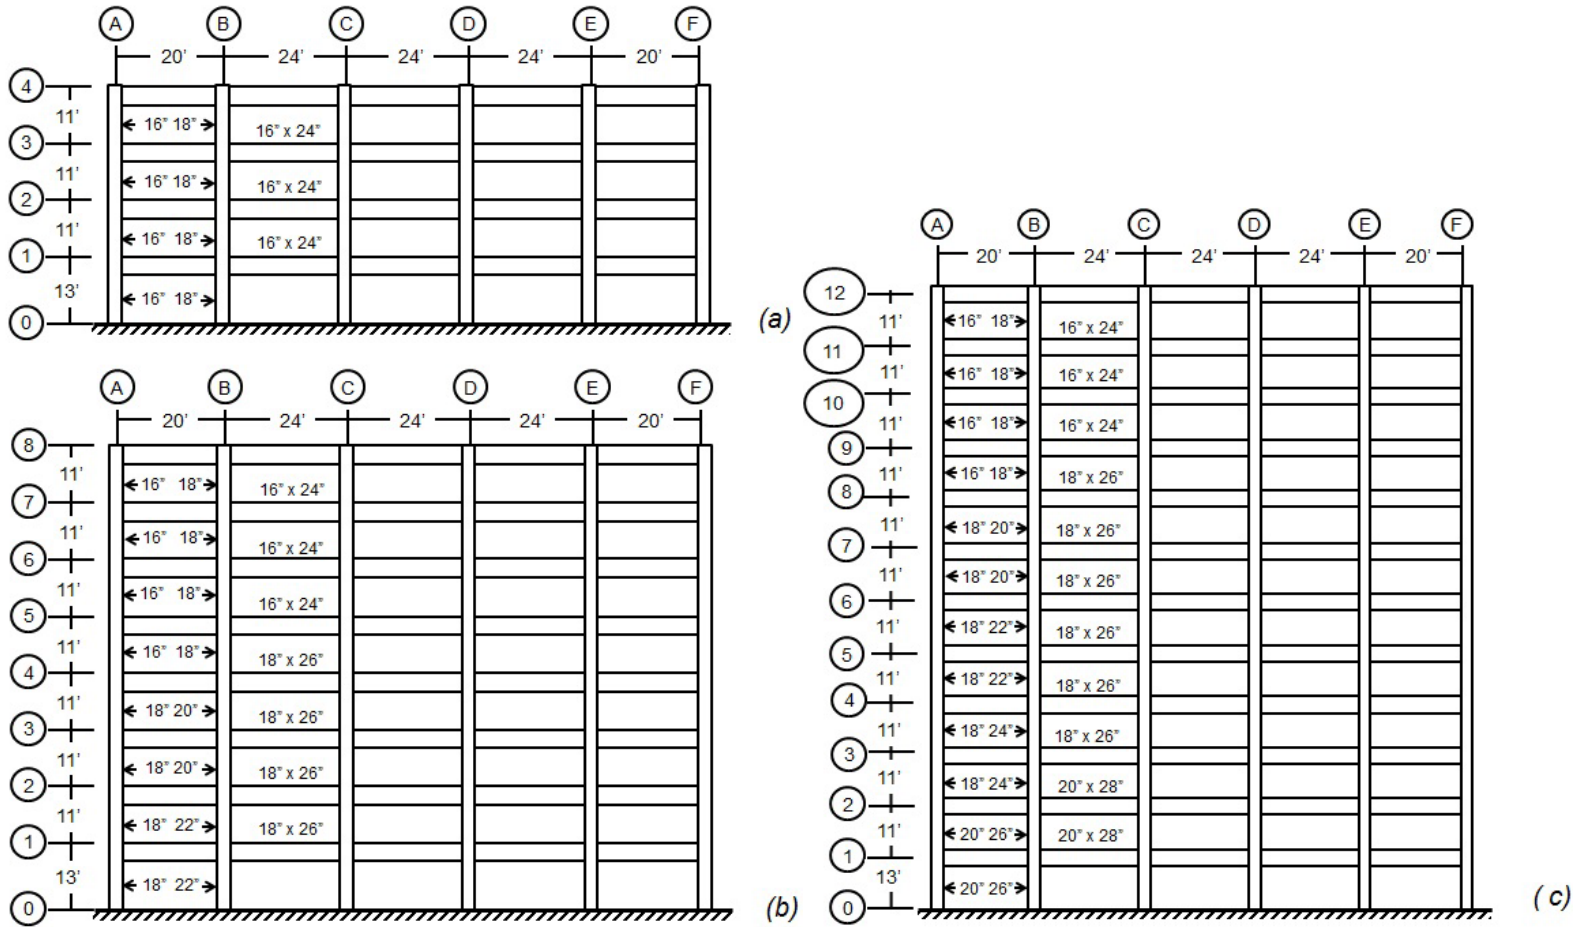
Schematic elevation view of the simulated frames: (a) 4-Story, (b) 8-Story, and (c) 12-Story buildings
